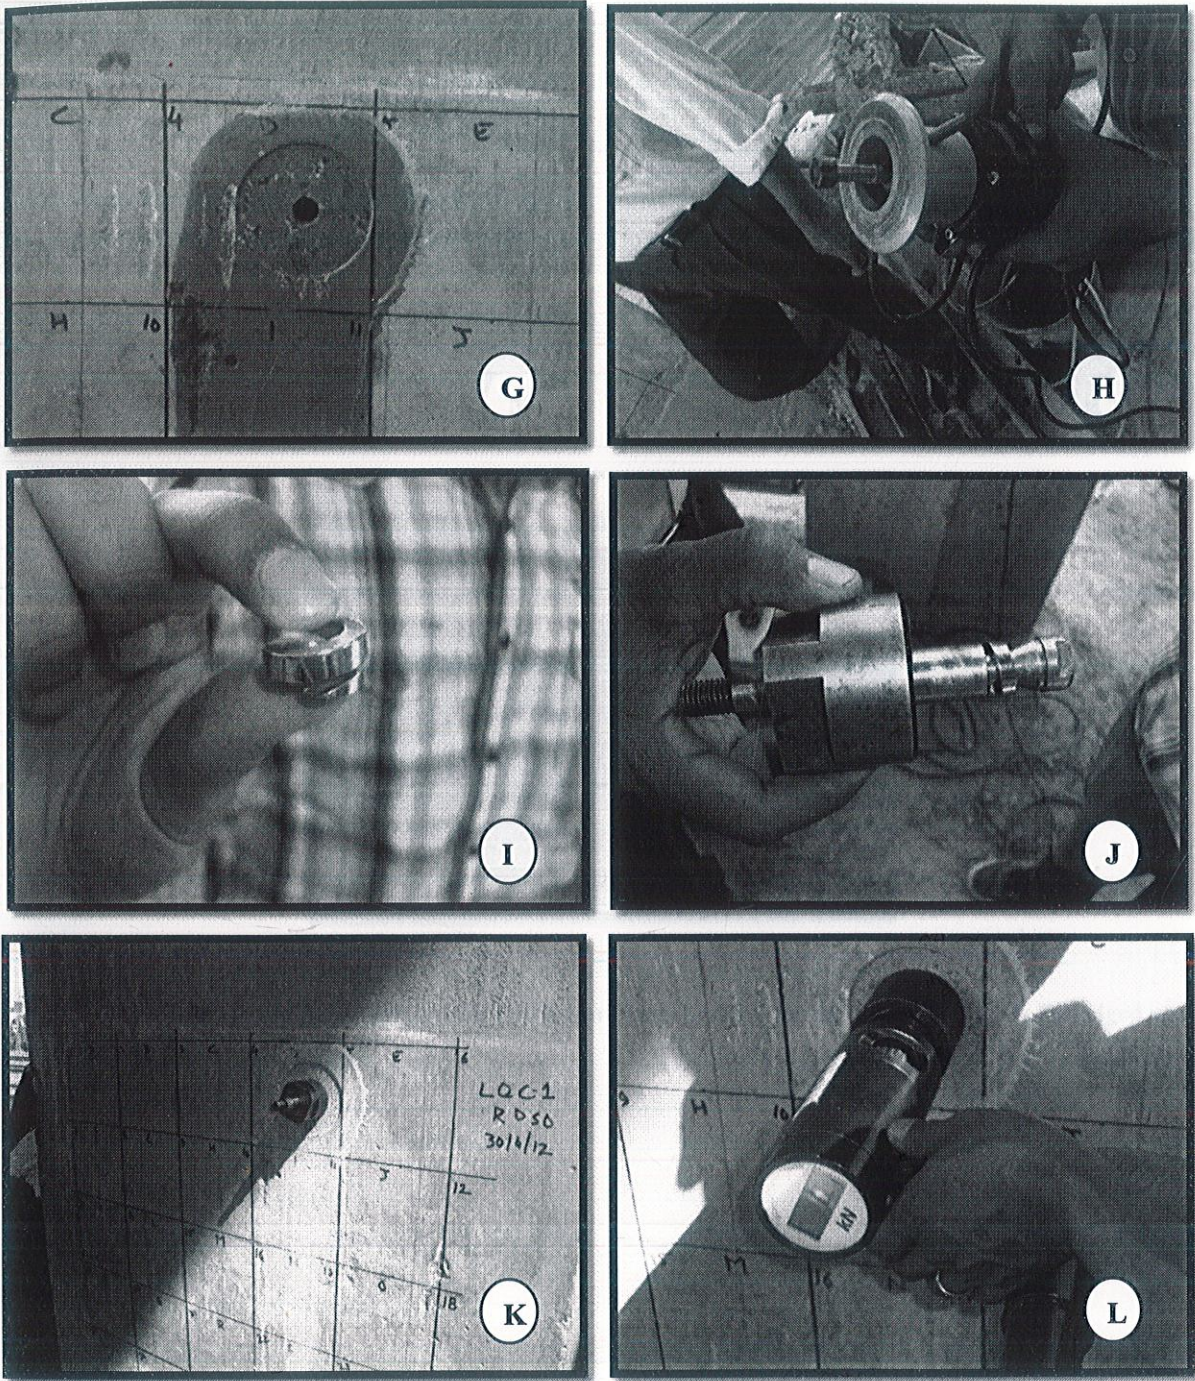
(G) Prepared surface for routing the recess (H) Recess Router unit (I) Expandable Inserts (J) Expansion Unit with Expandable Insert (K) Expansion Unit fixed in the center hole (L) Hydraulic pull machine with electronic gauge
